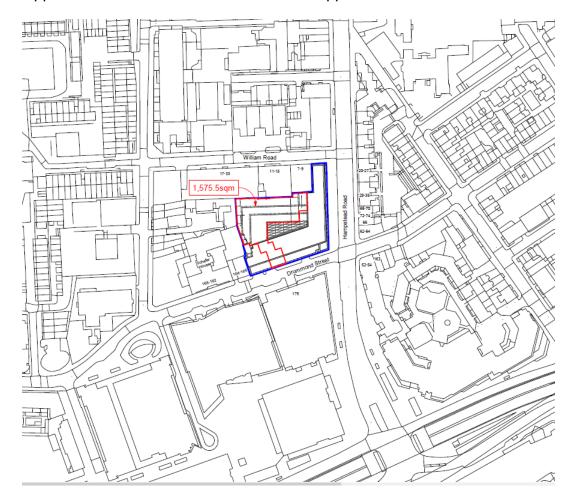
(above): The existing site (area in red denotes the demise of the ground floor premises and the area in blue denotes the entire building)
